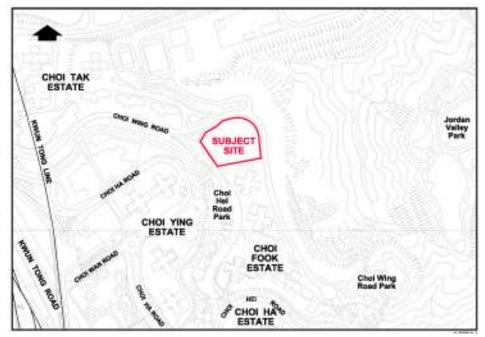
Location Plan of the Proposed Public Housing and IRC Development at Choi Wing Road
